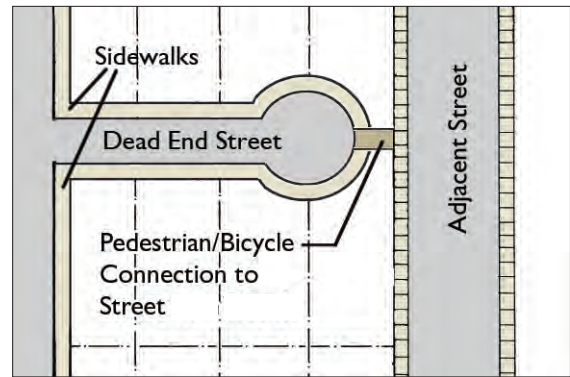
d: Diagram of a pedestrian-pass through connection between a dead end street and an adjacent street.
